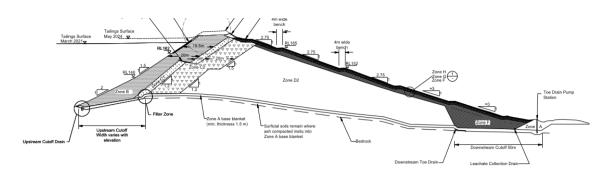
TYPICAL CROSS SECTION OF STORAGE 1A EMBANKMENT
